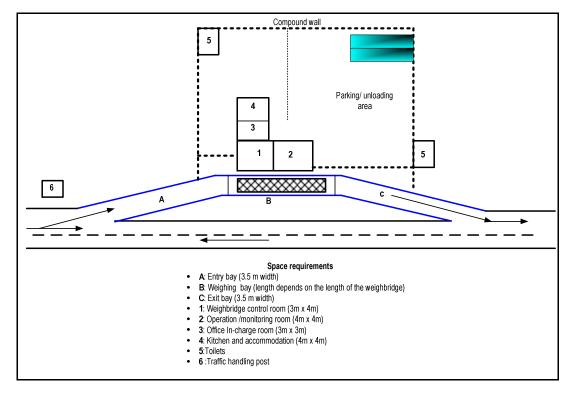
Schematic Diagram of a Typical Weighbridge Station -1 (Static and Fixed)
